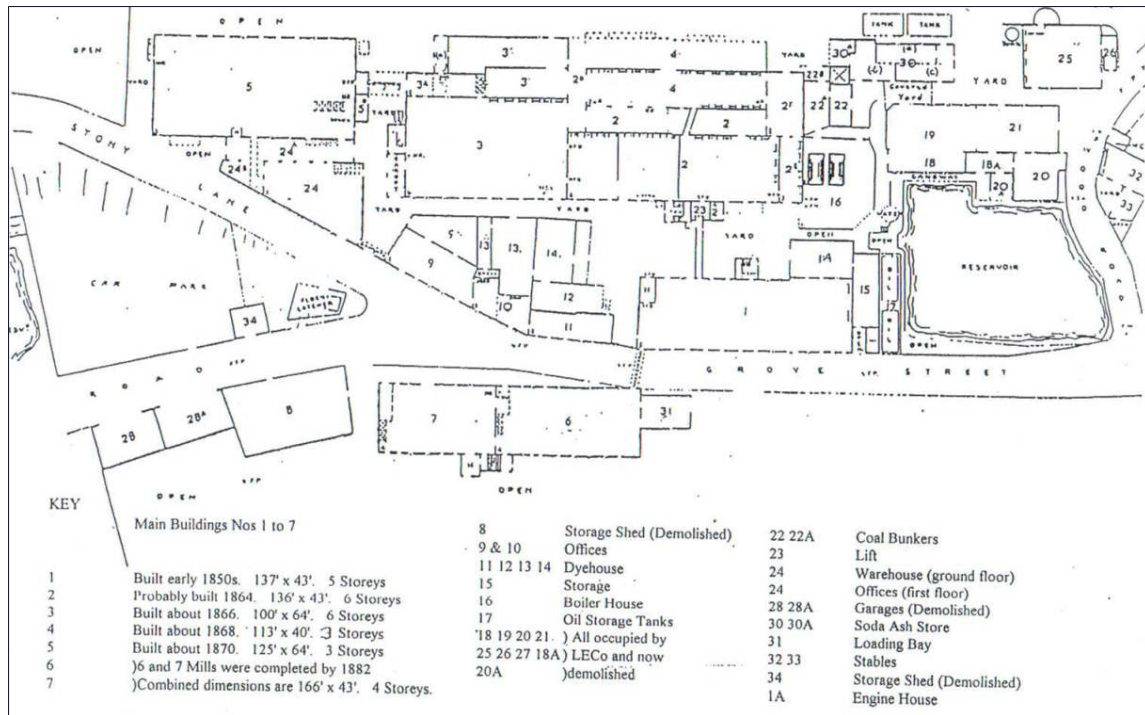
Site plan of Parkwood Mill showing the different buildings and features. Mill 6 and 7 are shown on the opposite side of Grove Street to the main complex (Source: Briden 2002)
